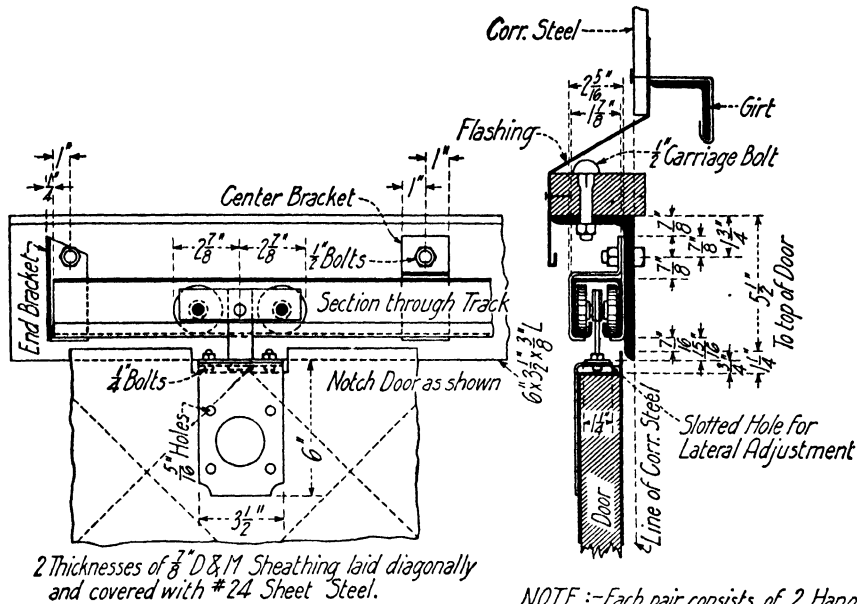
DETAILS OF A TRACK FOR A SLIDING DOOR.
